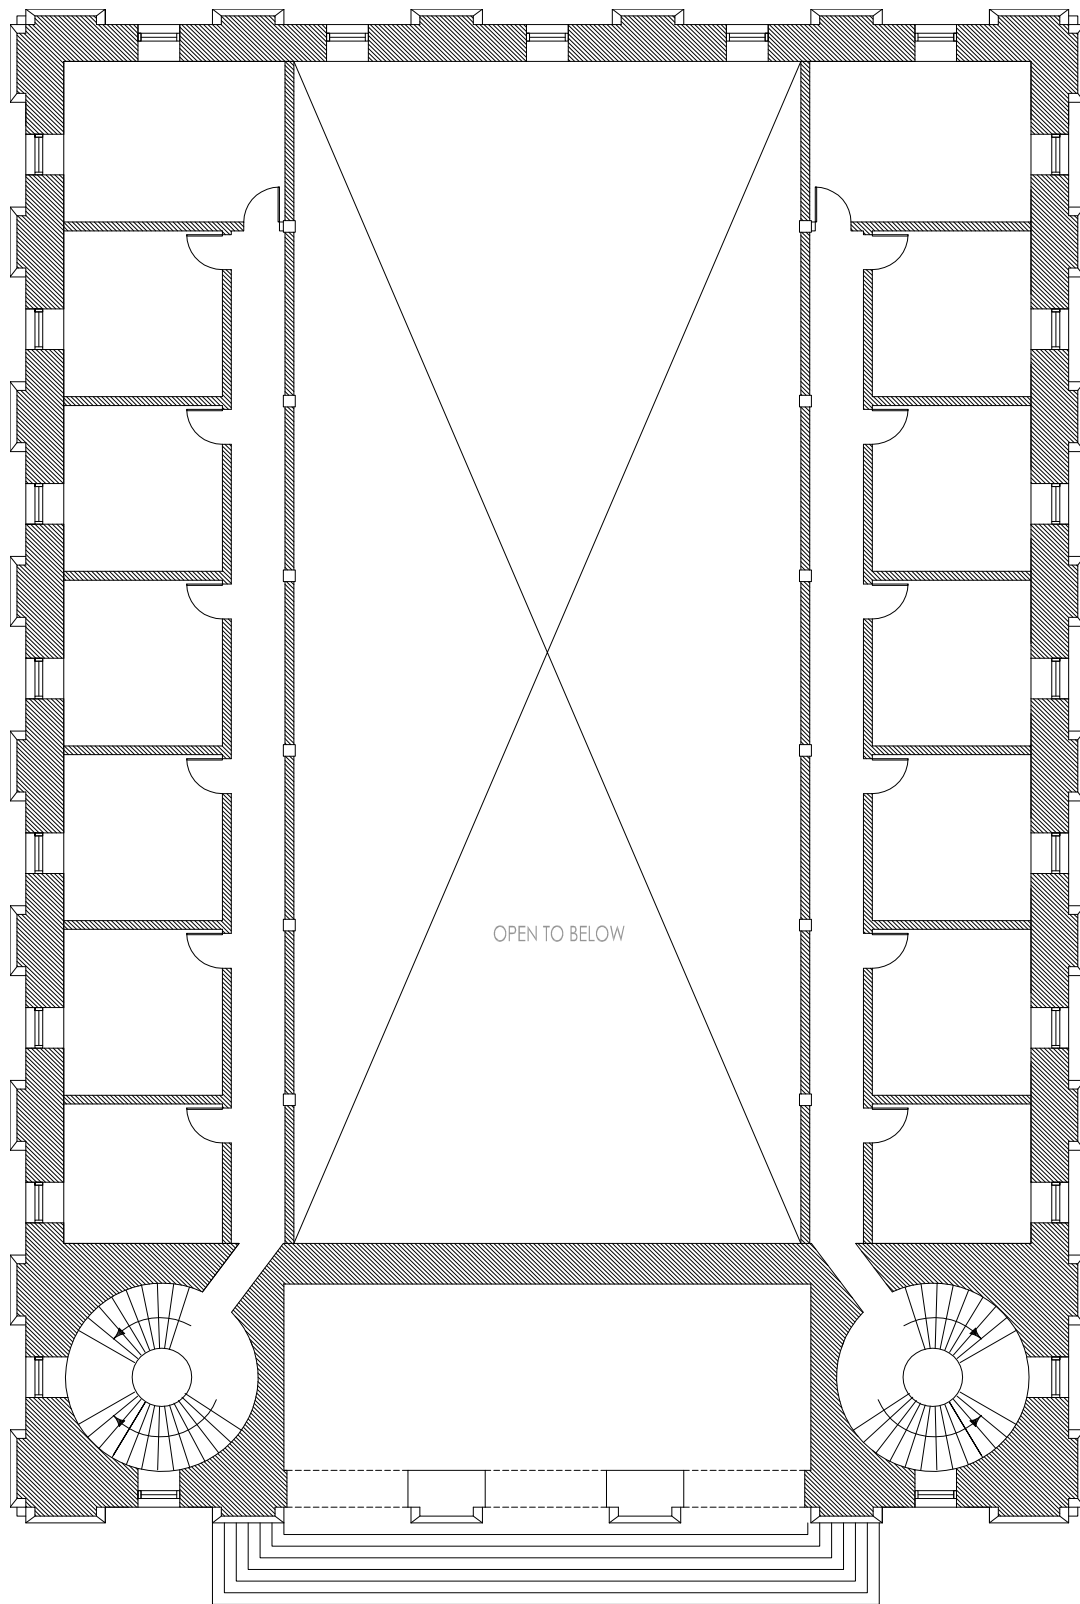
First floor mezzanine plan based on Lisle Brown and FFKR Architects reconstruction drawings. Drawn by author.
